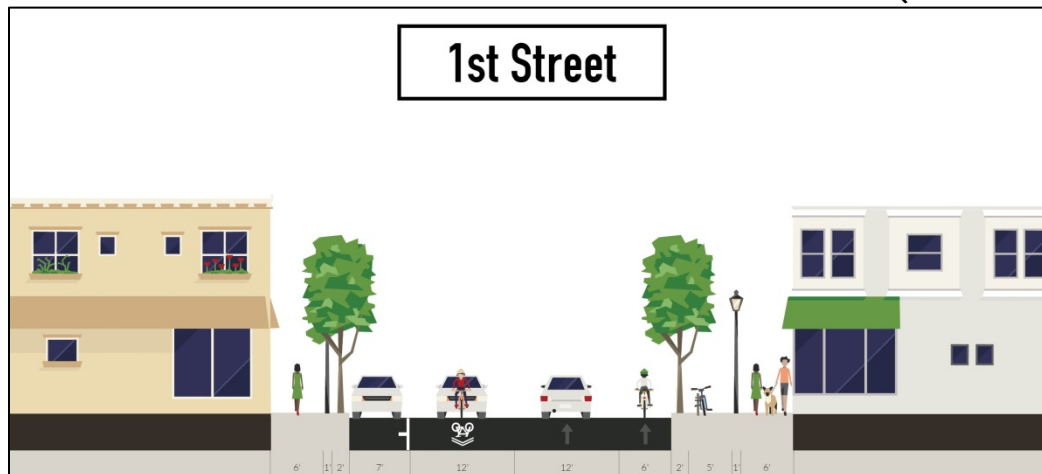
First Street Cross-section - Alternative 1 Residential (60 Feet Right-of-Way)
